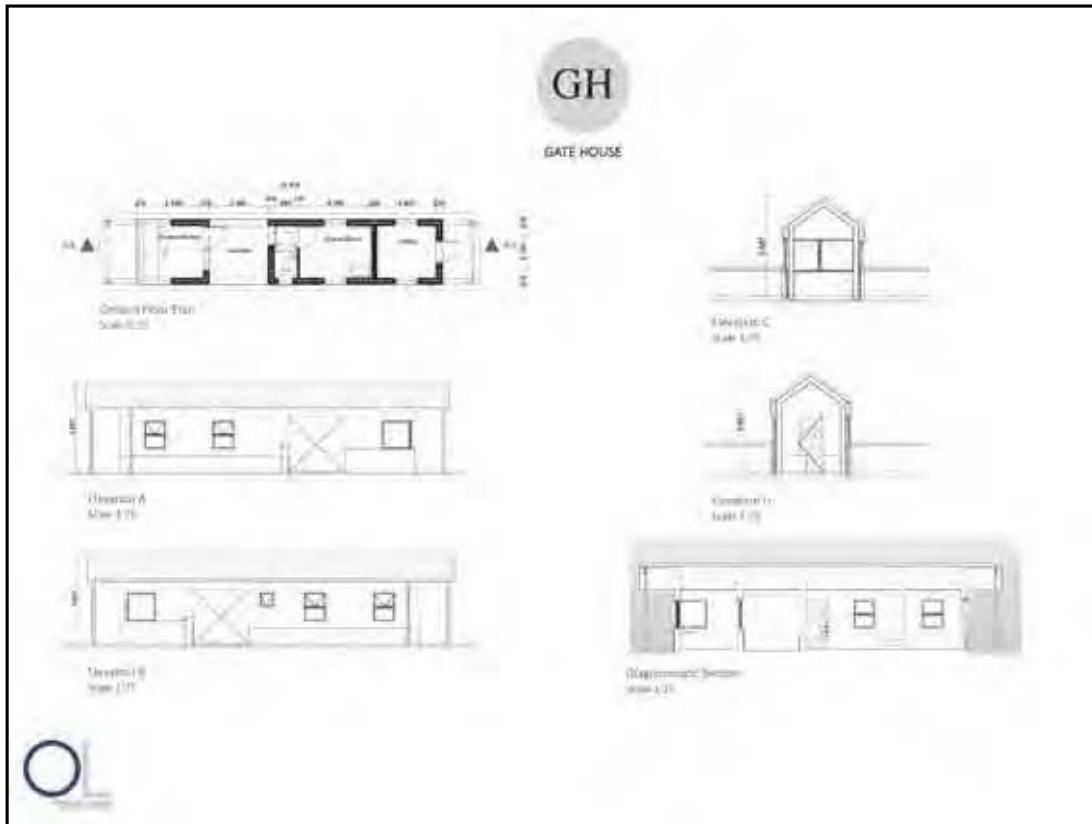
Typical Gate House and Elevations located on Erf 2154.
